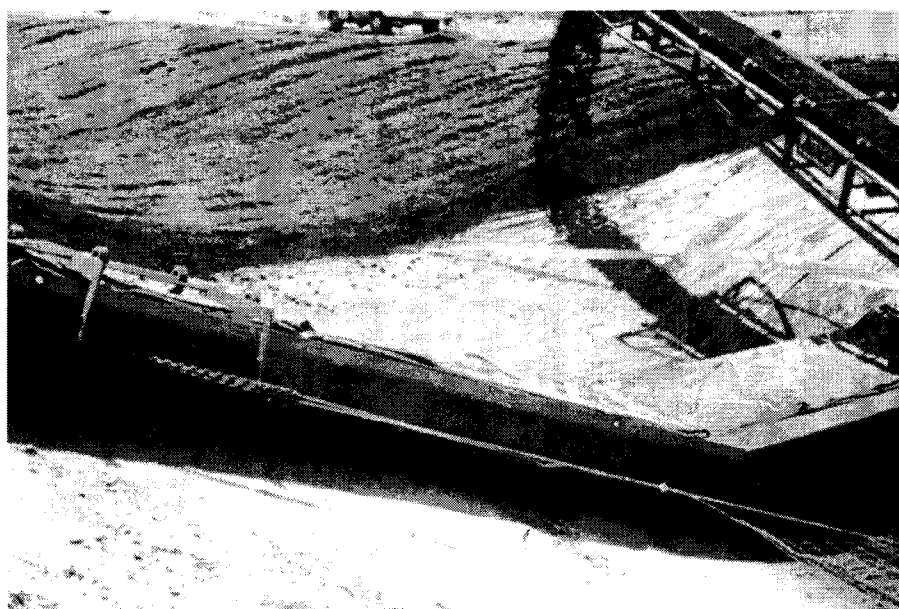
View showing placement of protective soil cover as PVC geomembrane is continually being installed.
